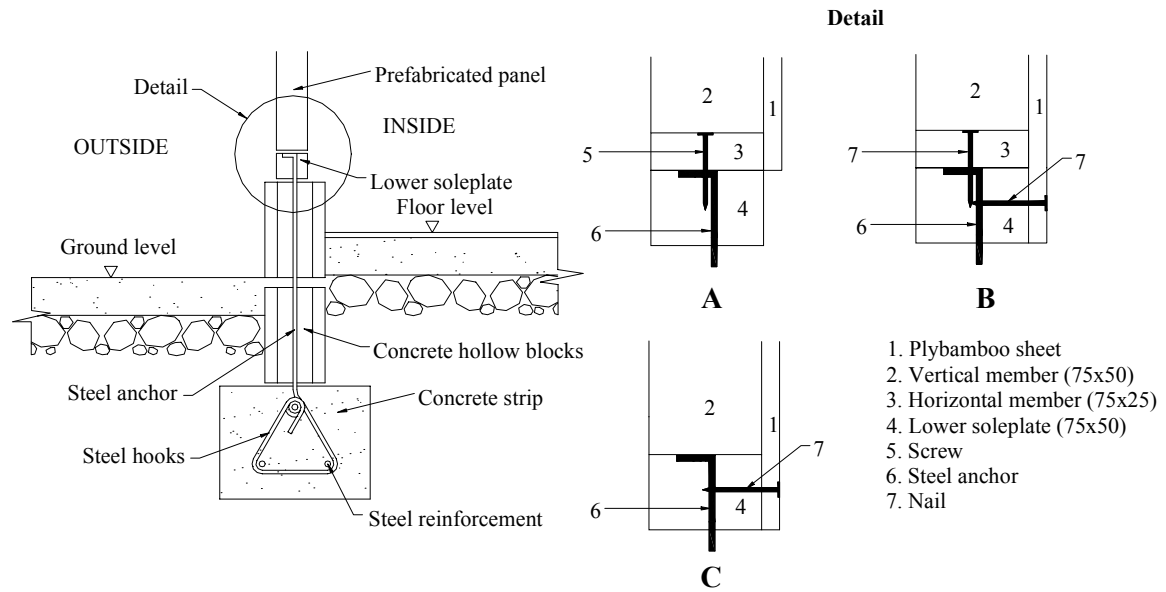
Left: vertical section of the foundation. Right: Details of the wall to foundation connection depending on the type of panel.
